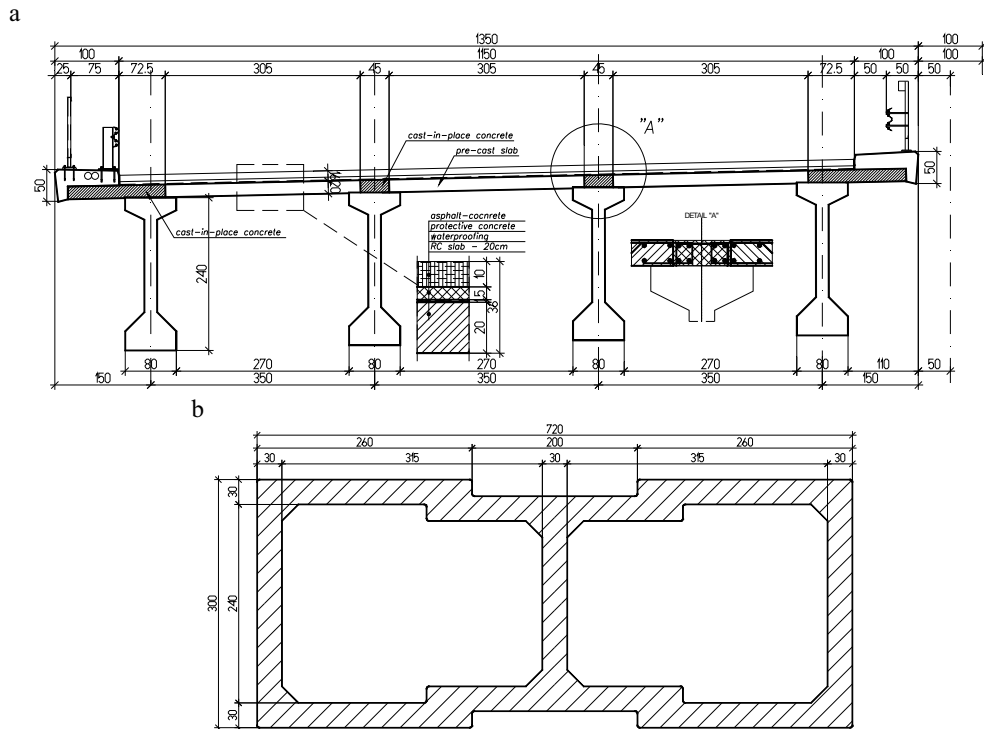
Original design of viaduct: (a) cross section of the superstructure; (b) cross section of the pier.
